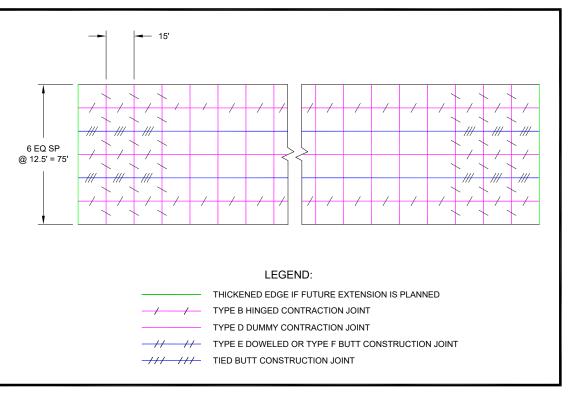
(Optional) Joint Layout Concrete Pavement – 75 Foot Runway Width (Pavements ≤ 9 inches)¹
